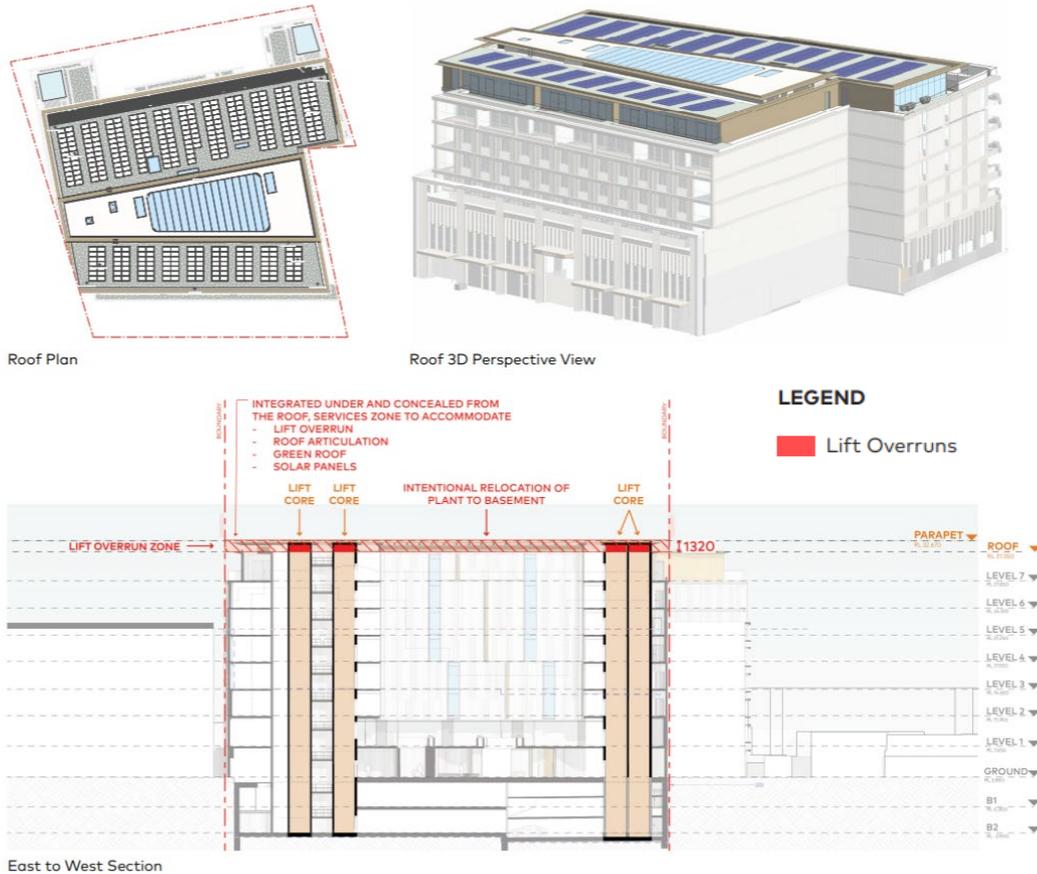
Roof design with concealed lift overruns under roof structure, diagram prepared by COX
